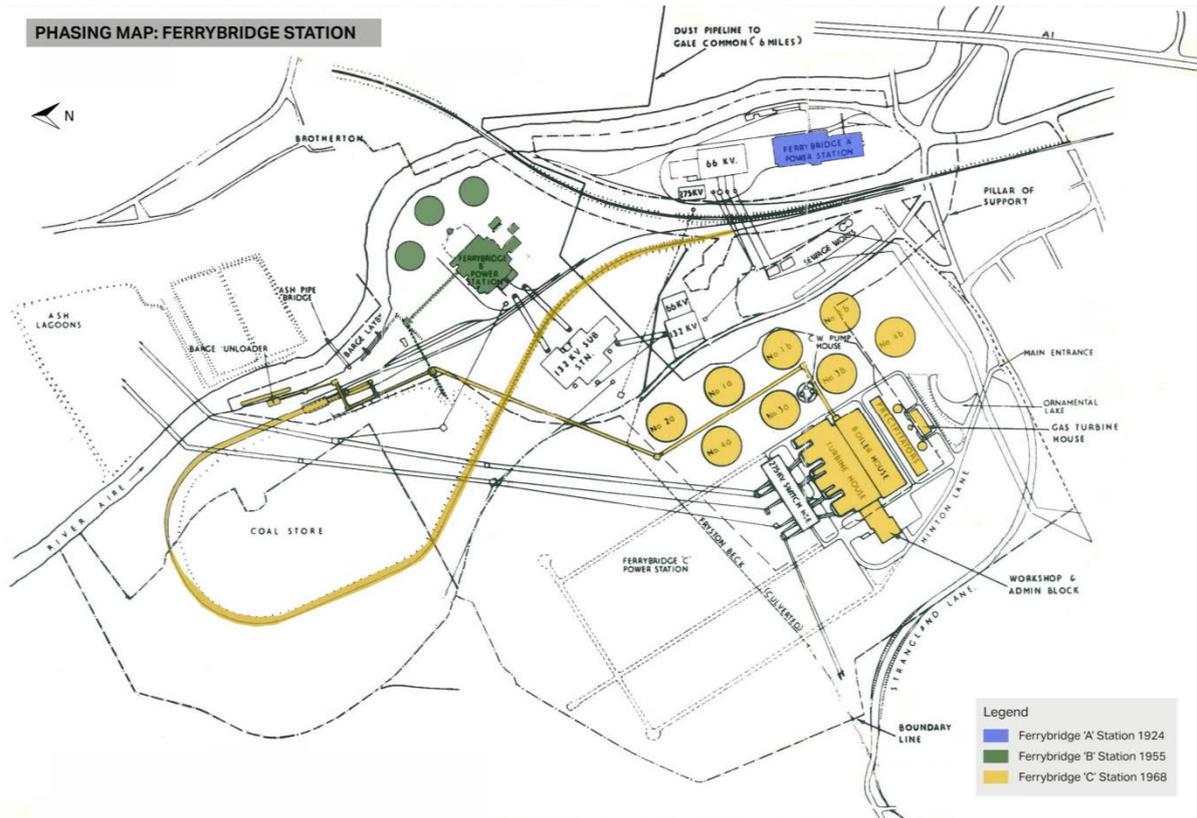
Map of Ferrybridge Power Stations Site Layout in 1966 when all three power stations were designed to work in tandem. Ferrybridge 'A' to the east, Ferrybridge 'B' to the north and Ferrybridge 'C' to the south-west.
